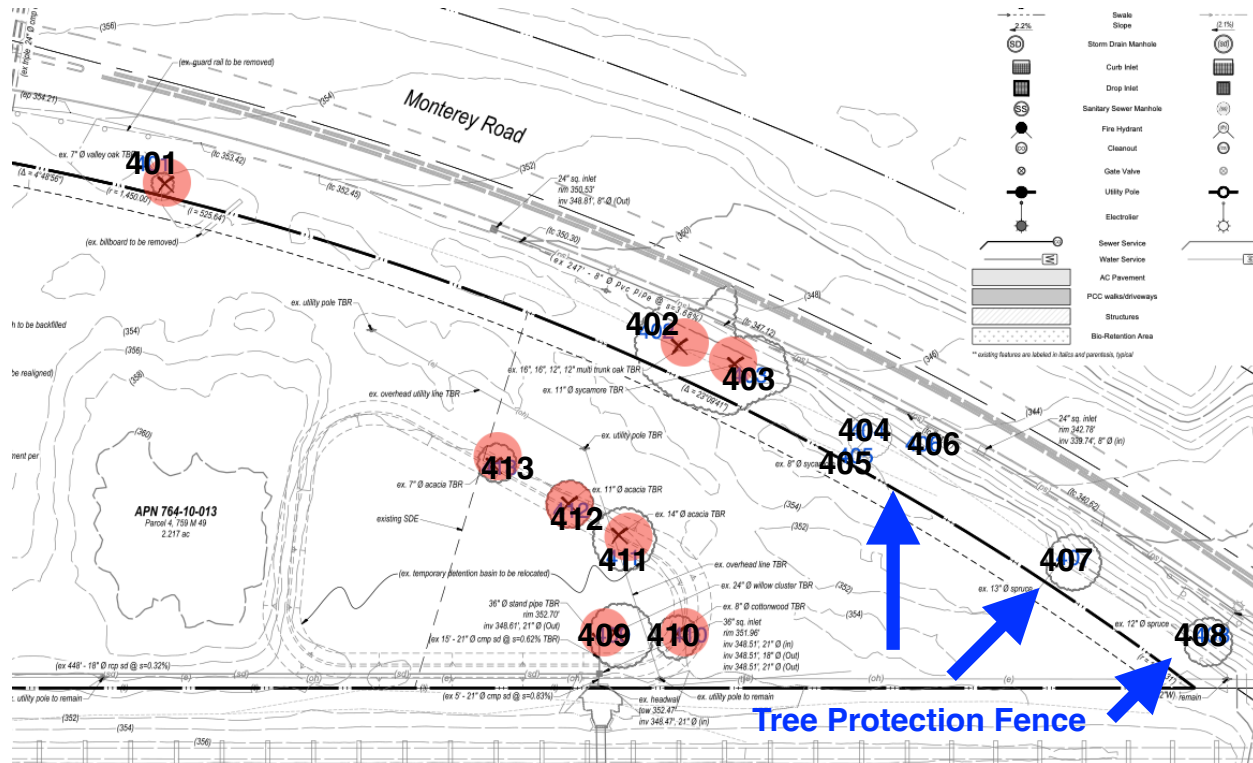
TREES IN RED TO BE REMOVED, TREE PROTECTION SHOULD BE ESTABLISHED AT EIGHT TIMES THE TRUNK DIAMETER RADIUS OF #404 = 8 FEET, #405 = 8 FEET, #406 = 8 FEET, #407 = 11 FEET, #408 = 8 FEET
